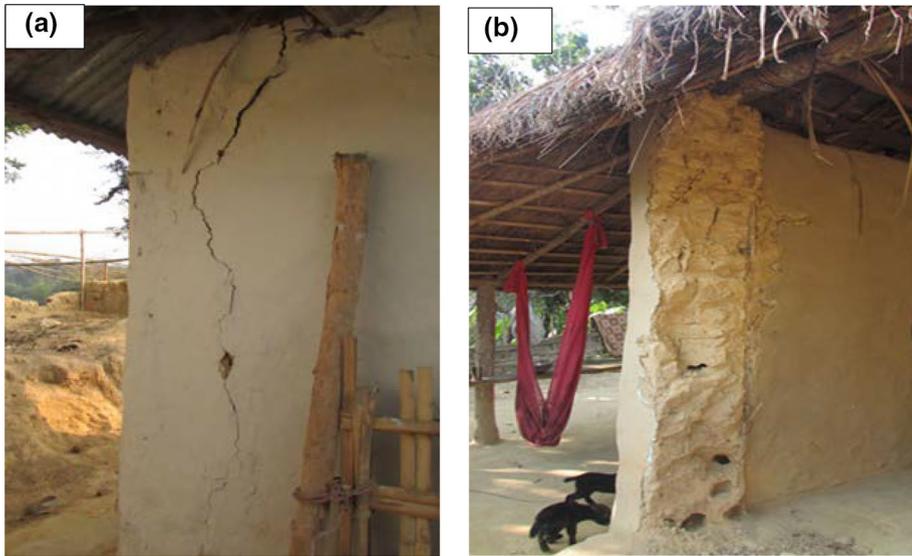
a, b Damages of the two mud houses due to the formation of vertical crack at the corner and out-of-plane collapse failure
